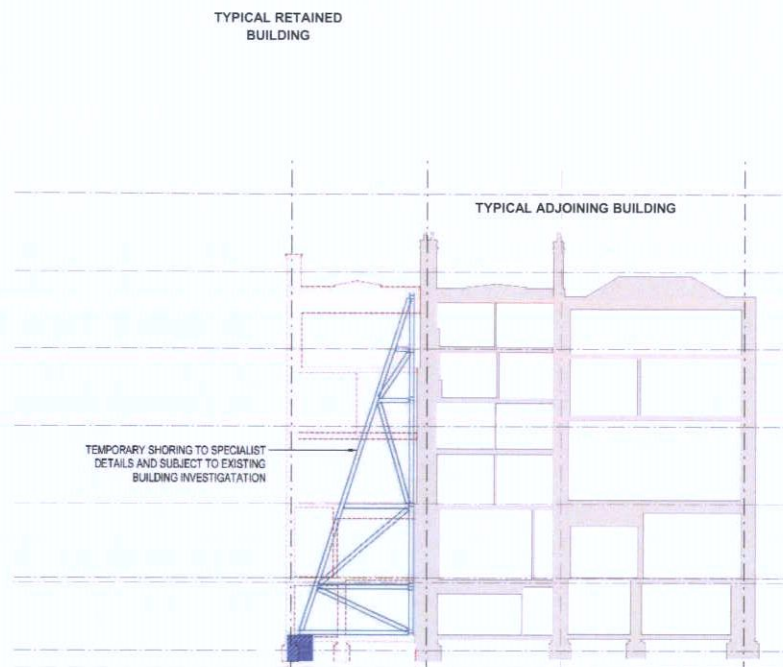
34 Henry Street Temporary Boundary/Adjoining Retention System
